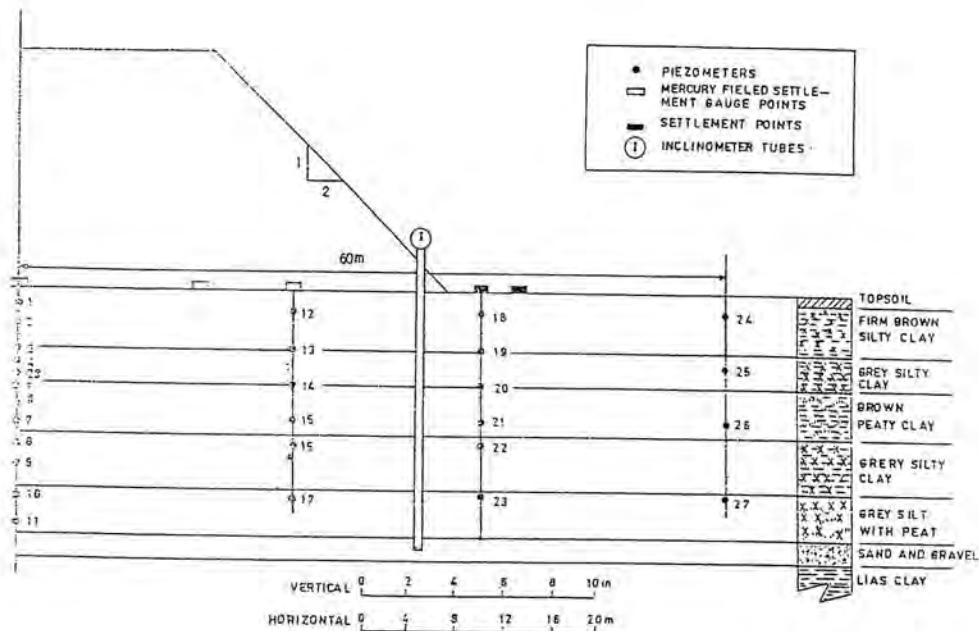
Cross Section of Embankment Showing Location of Instruments
